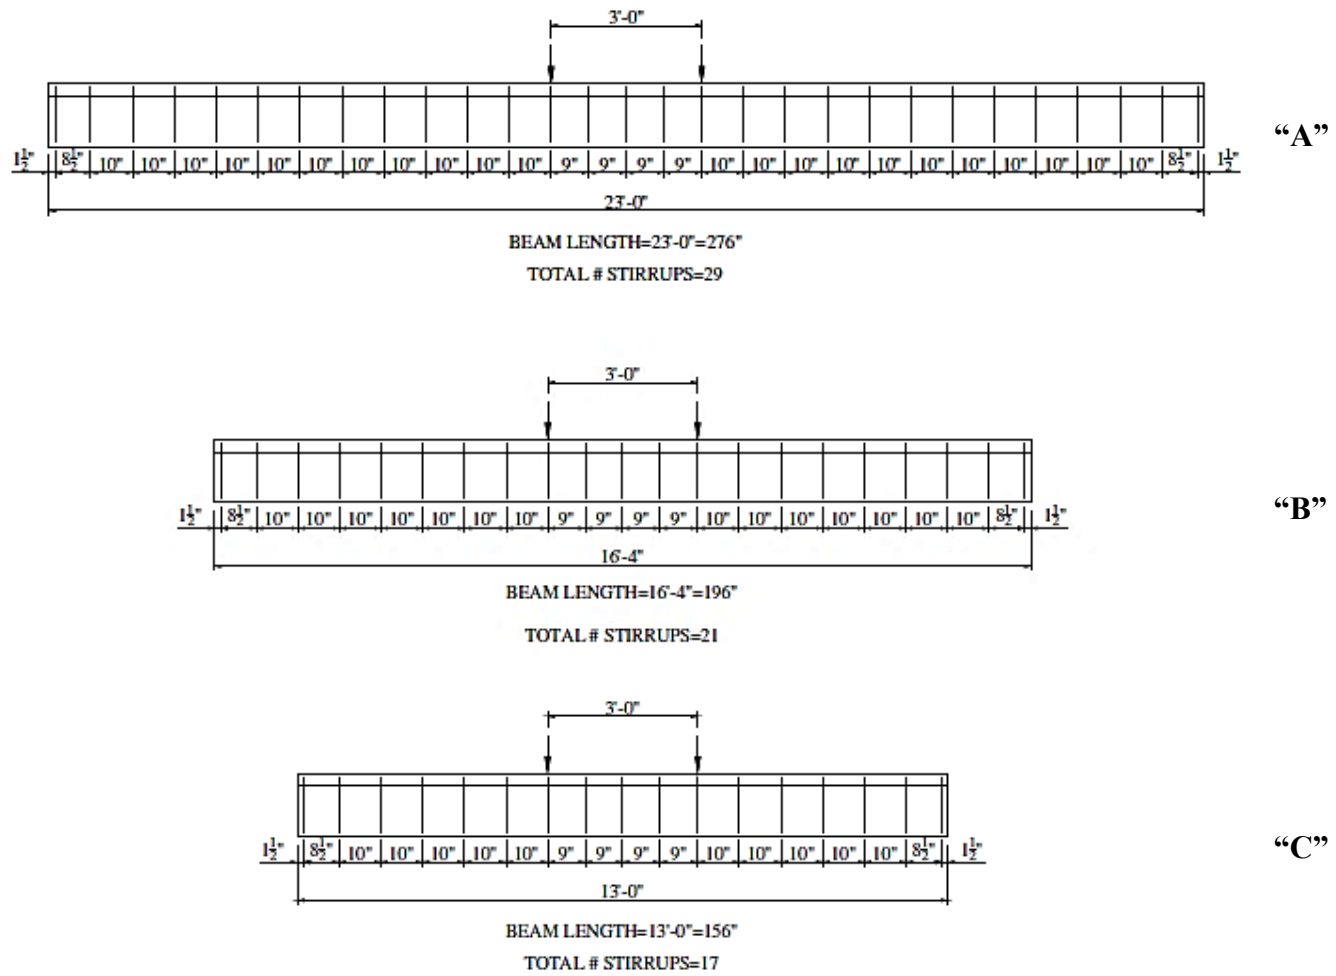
T-Beams—Stirrup Spacing for “A”, “B”, and “C” Specimens (Levy 2007)
